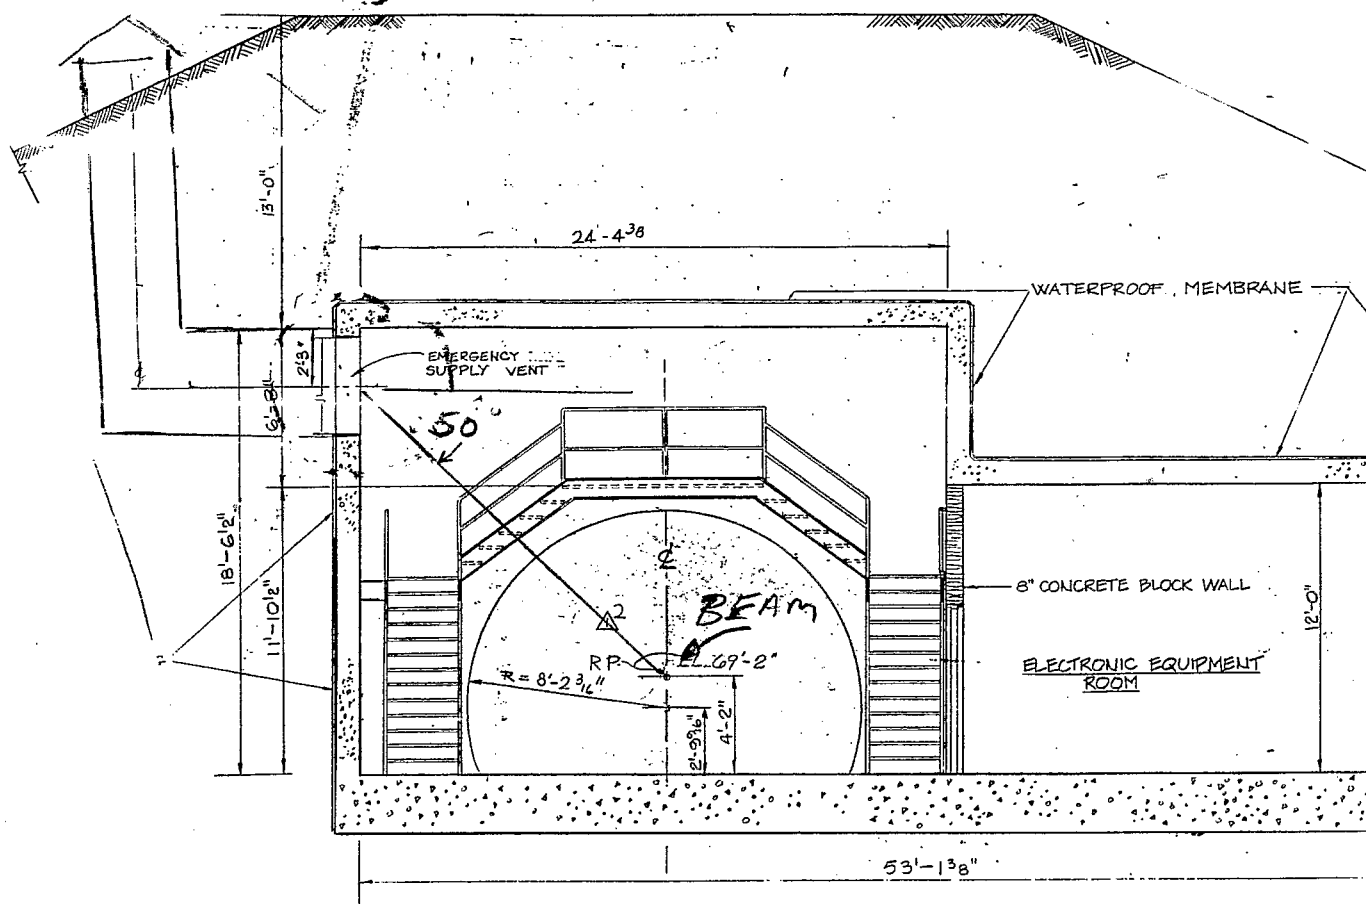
The ventilation duct at Equipment Area 7-B, showing the elevation of the duct above the beamline.
